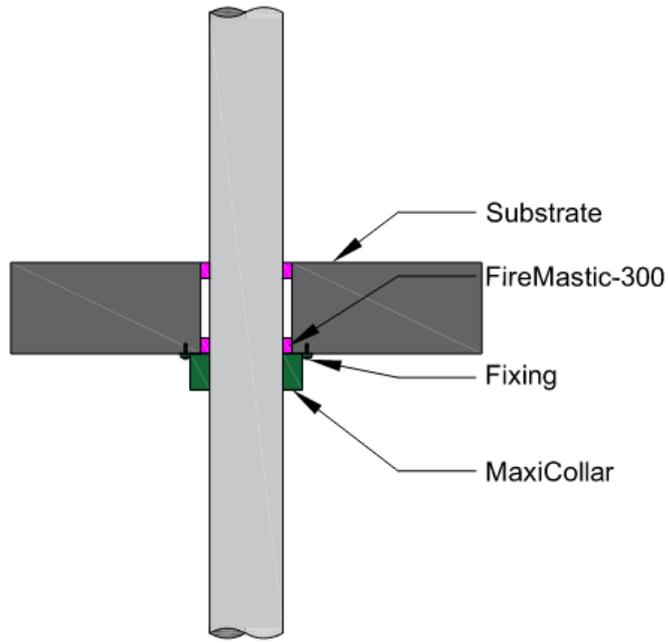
Typical installation of pipes fitted perpendicular to floor system with BOSS MaxiCollar™ installed on the exposed face
